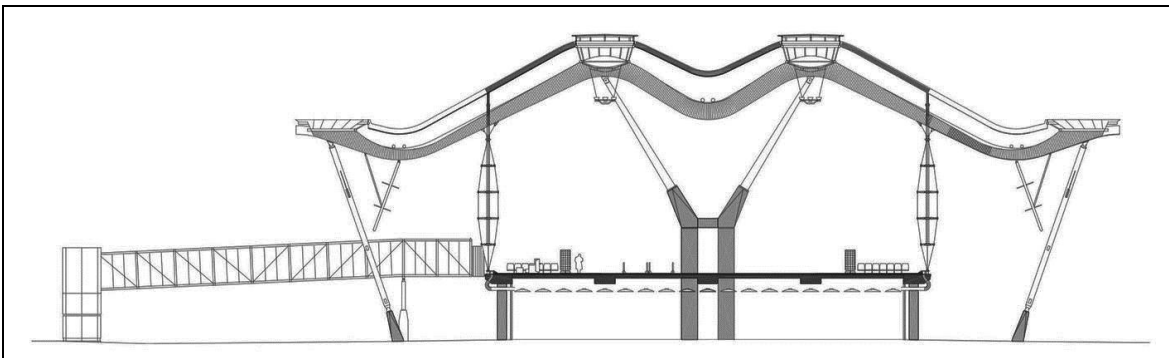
Section of the terminal building. Source: (Santibañez, 2018)
